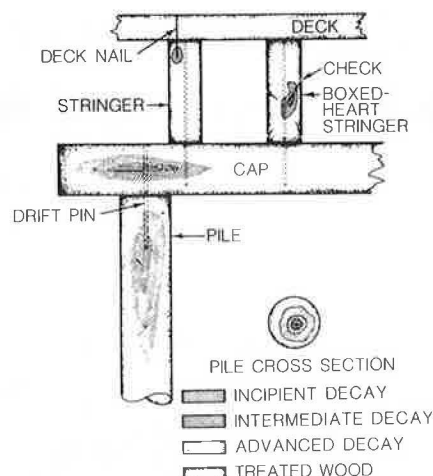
Schematic diagram of a portion of a pile bent, stringers, and deck showing locations where decay is most likely to occur.
